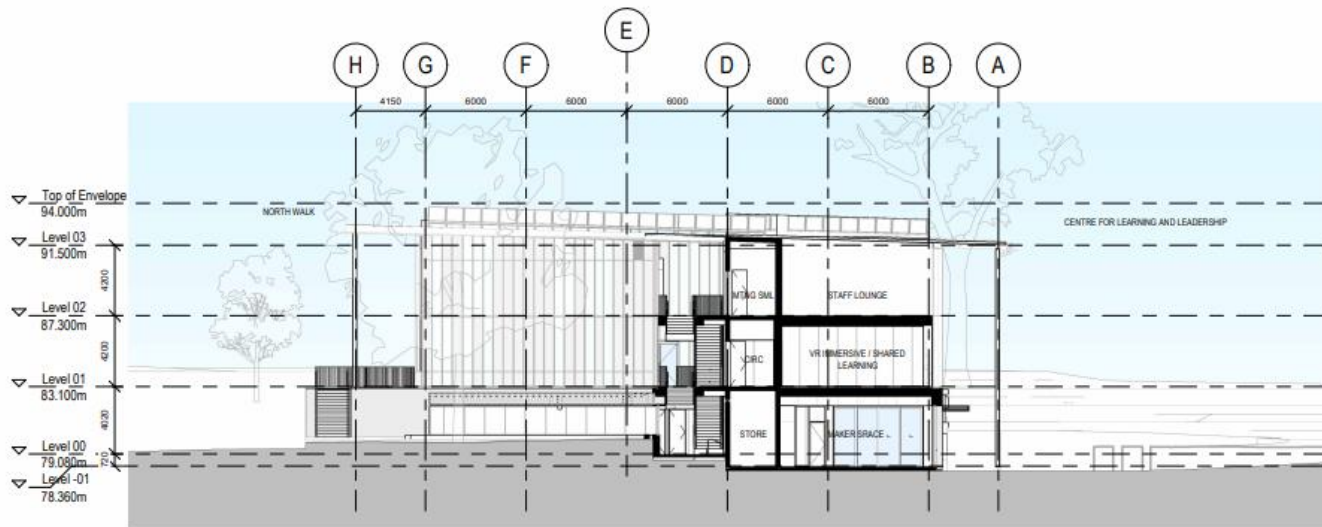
East-West Sections, STEAM Building, showing partial excavation in the east to approximately 0.7m.
